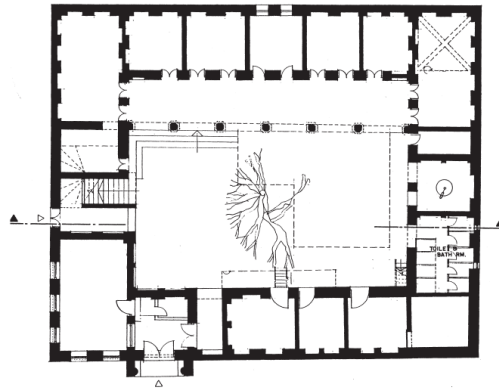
Plan view of a typical house in Al Bastakiyyah with Liwan design. [7]
